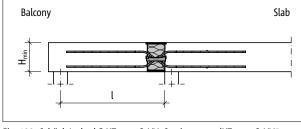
Schöck Isokorb® XT type Q-VV: Static system (XT type Q-VV5 to VV8)
